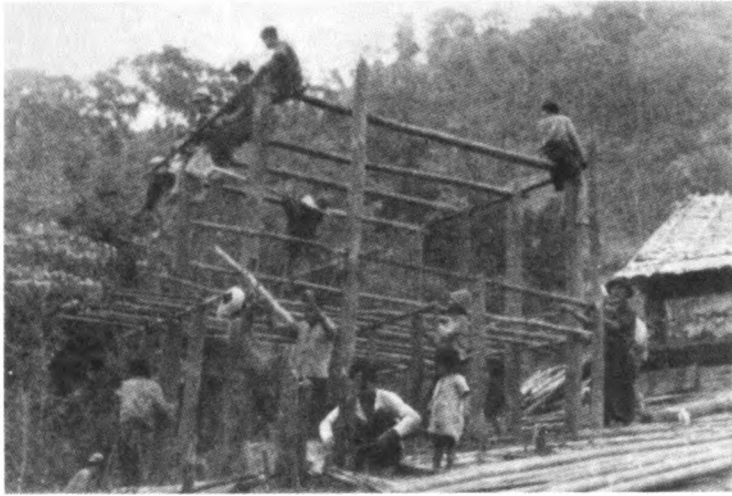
House building in Pouvé Luong, Upper Lamet. The framework under construction.
